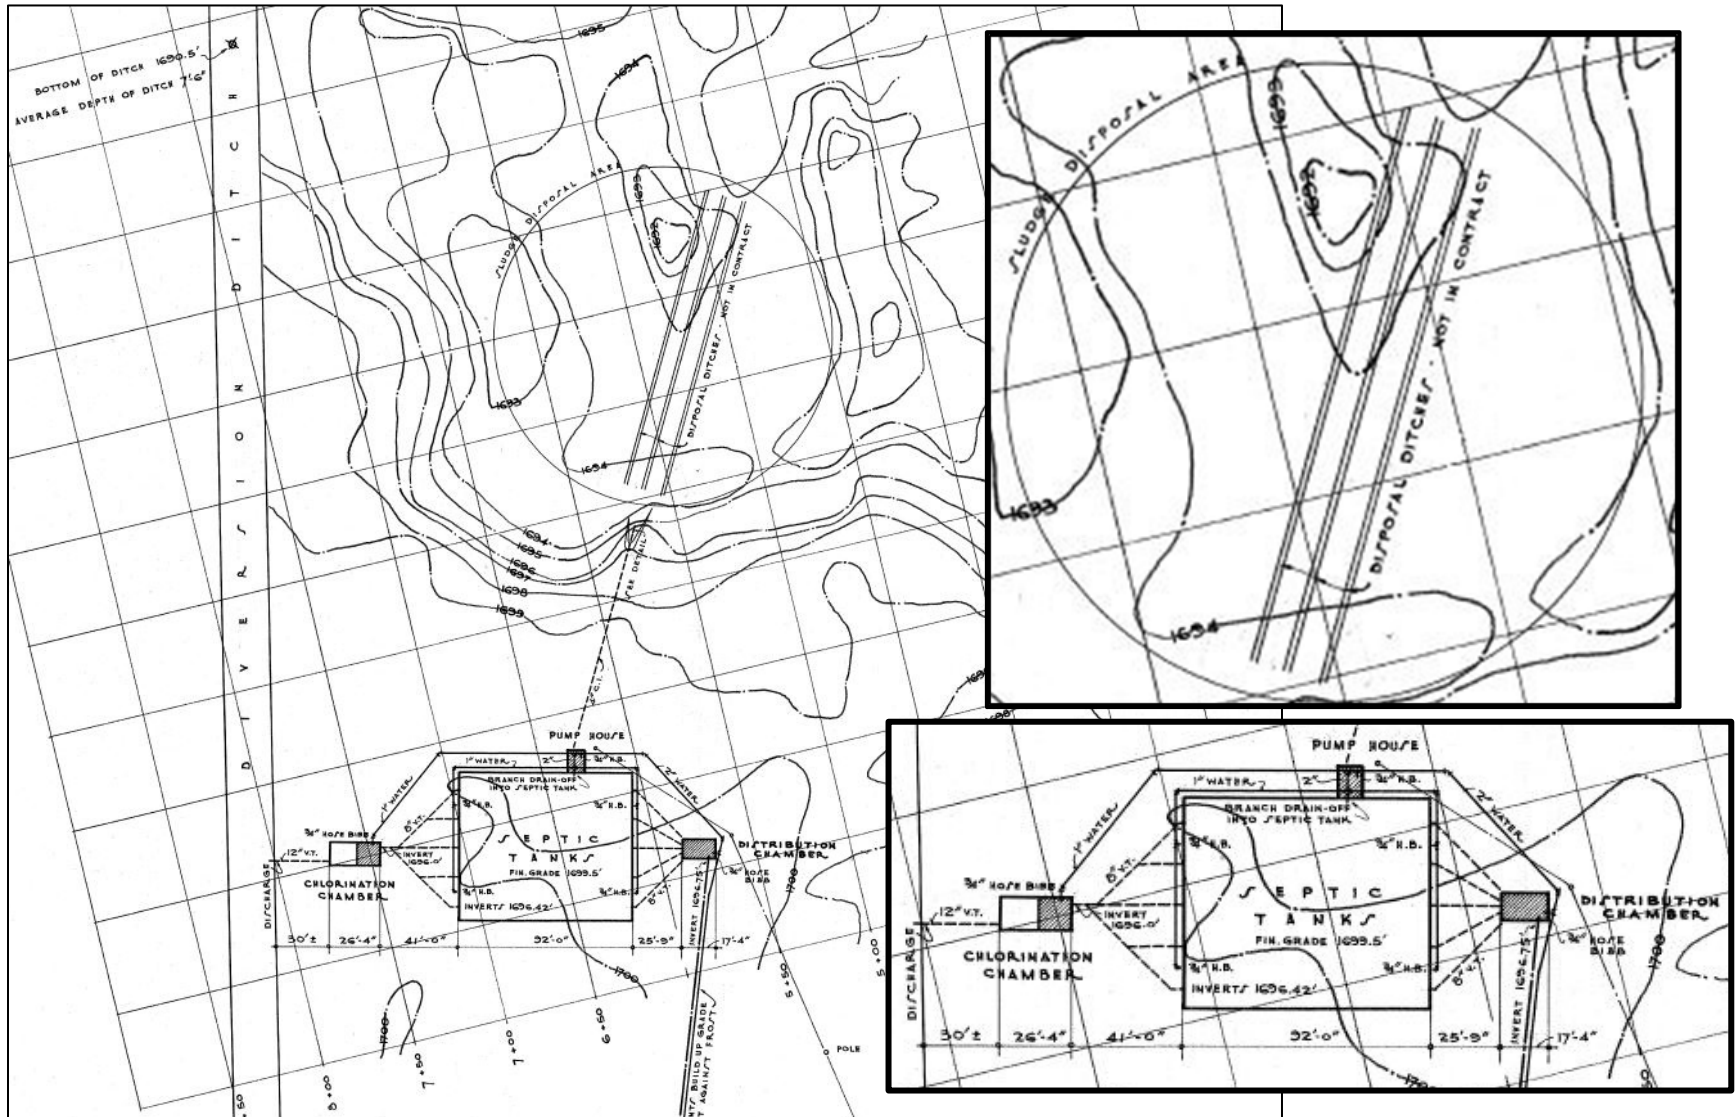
1941 Construction drawing - Site plan of septic system and sludge disposal ditches (measurements in feet and inches)
